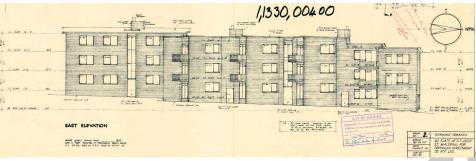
East elevation of the new OYO flats at 5-7 Ascot Street, Malvern, 1969 (SHC)
